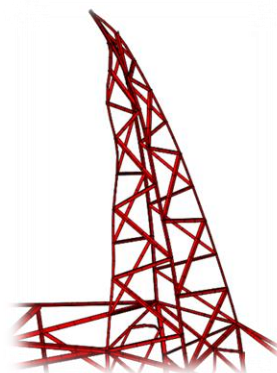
Failure (segment buckling) of the tower for the load $F_x=12.845$ kN at the top.
